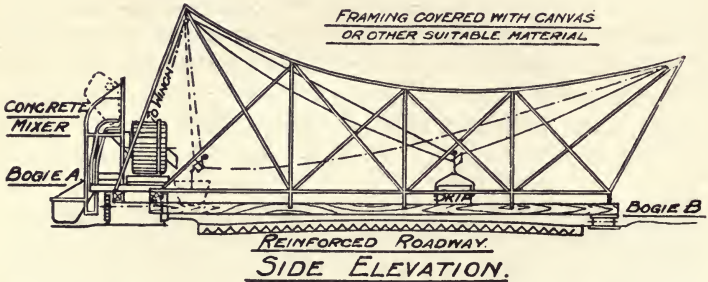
Road-laying machine used for concrete by the Port of London Authority.
